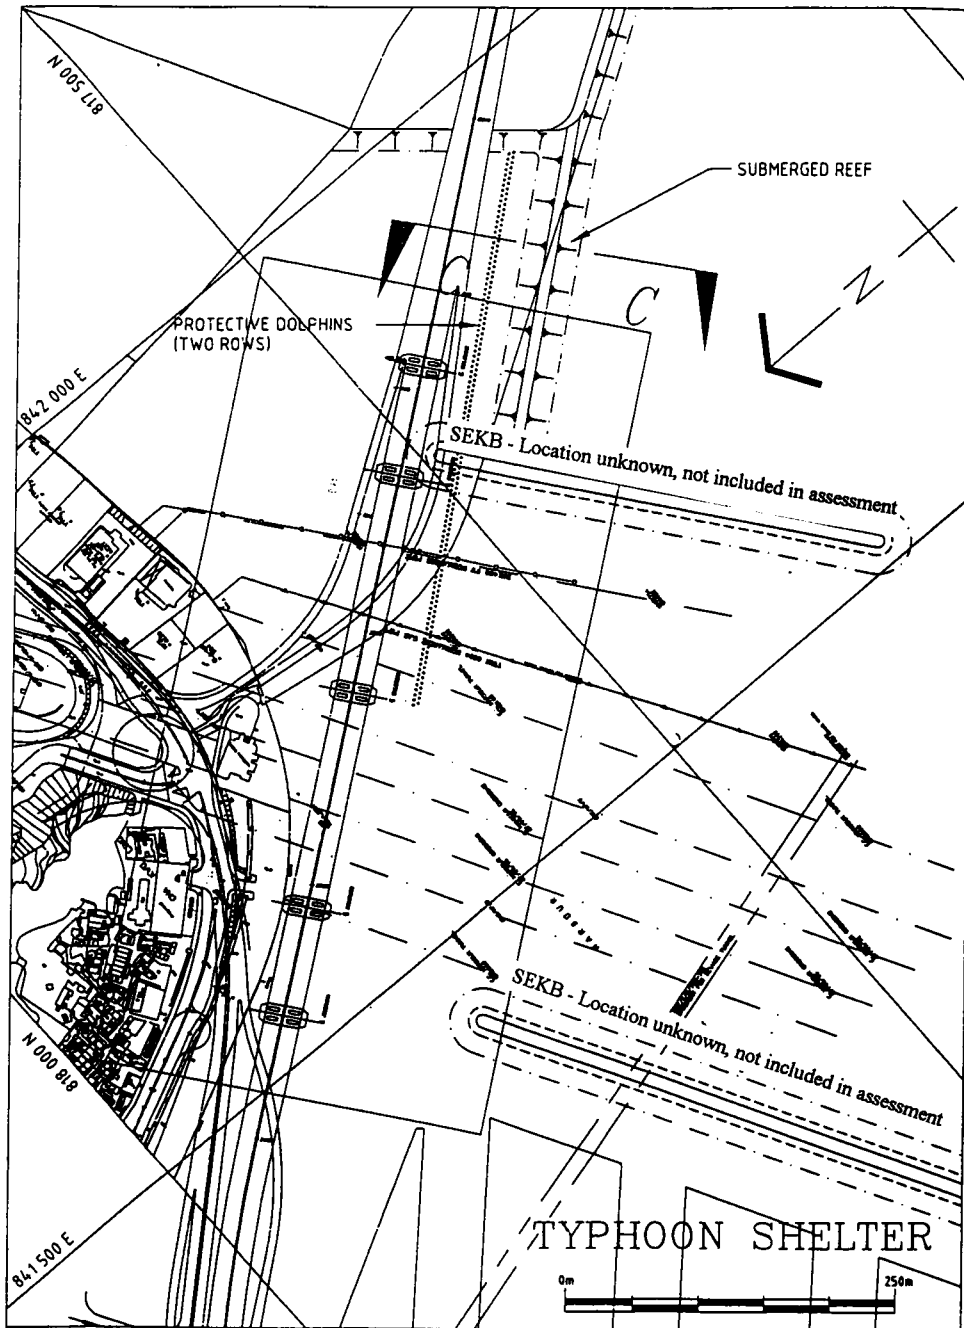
Sketch showing the planned design of the Western Coast Road.
